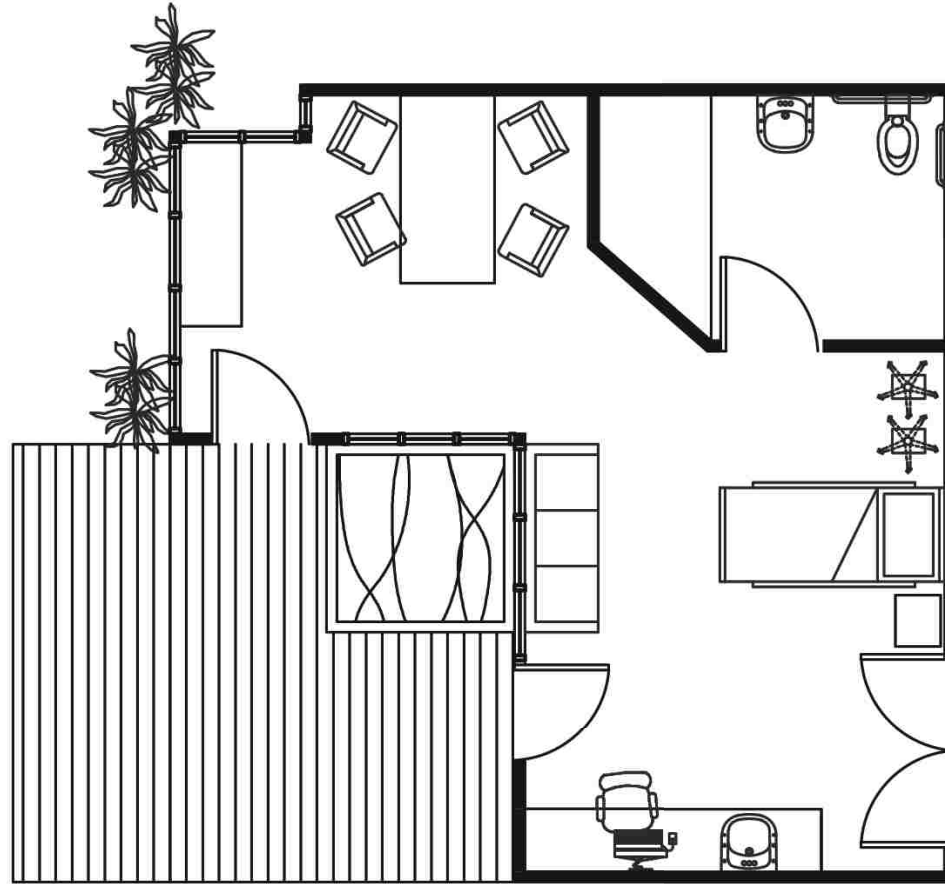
Type C Room Layout | acute units with private Jacuzzi. Source: Author
